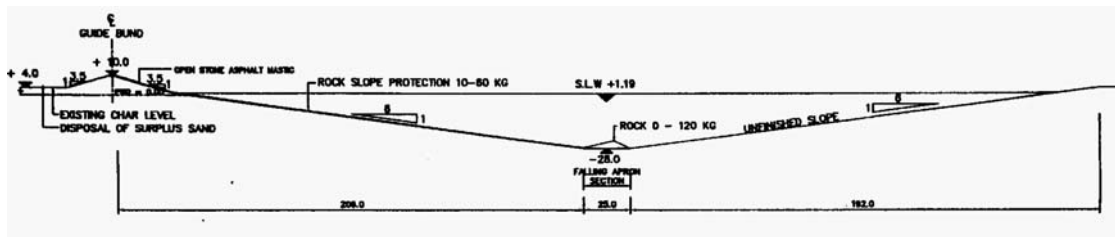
(b) Padma Bridge at Mawa (Pre-F/S): Typical Cross Section of Guide Bund
